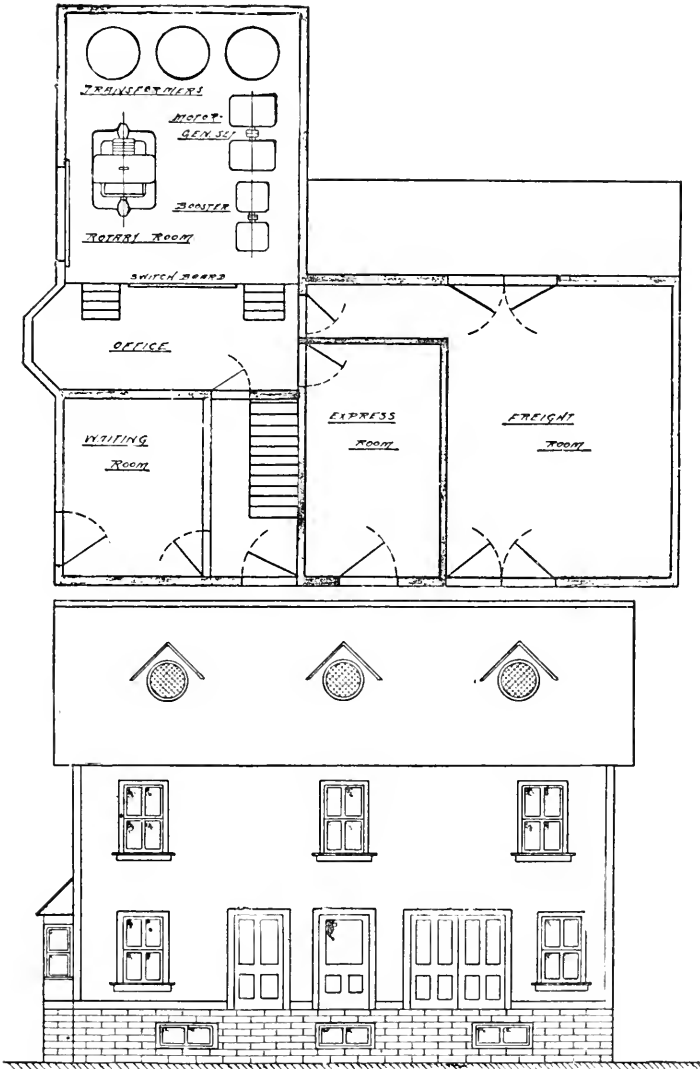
PLAN, AND SIDE ELEVATION OF A TYPICAL SUBSTATION, FREIGHT, EXPRESS AND PASSENGER OFFICE, AND DWELLING FOR ATTENDANT.
